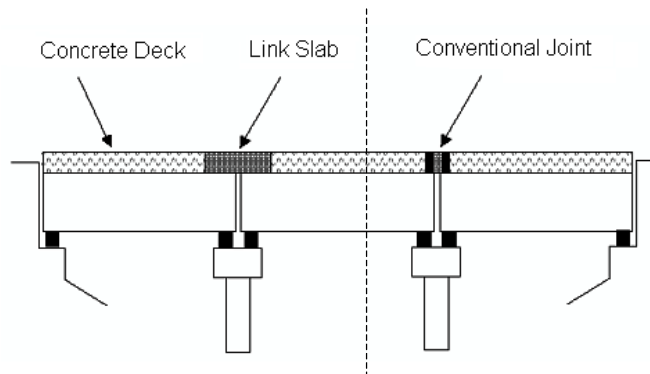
Bridge deck with ECC link slab and conventional mechanical steel expansion joint
